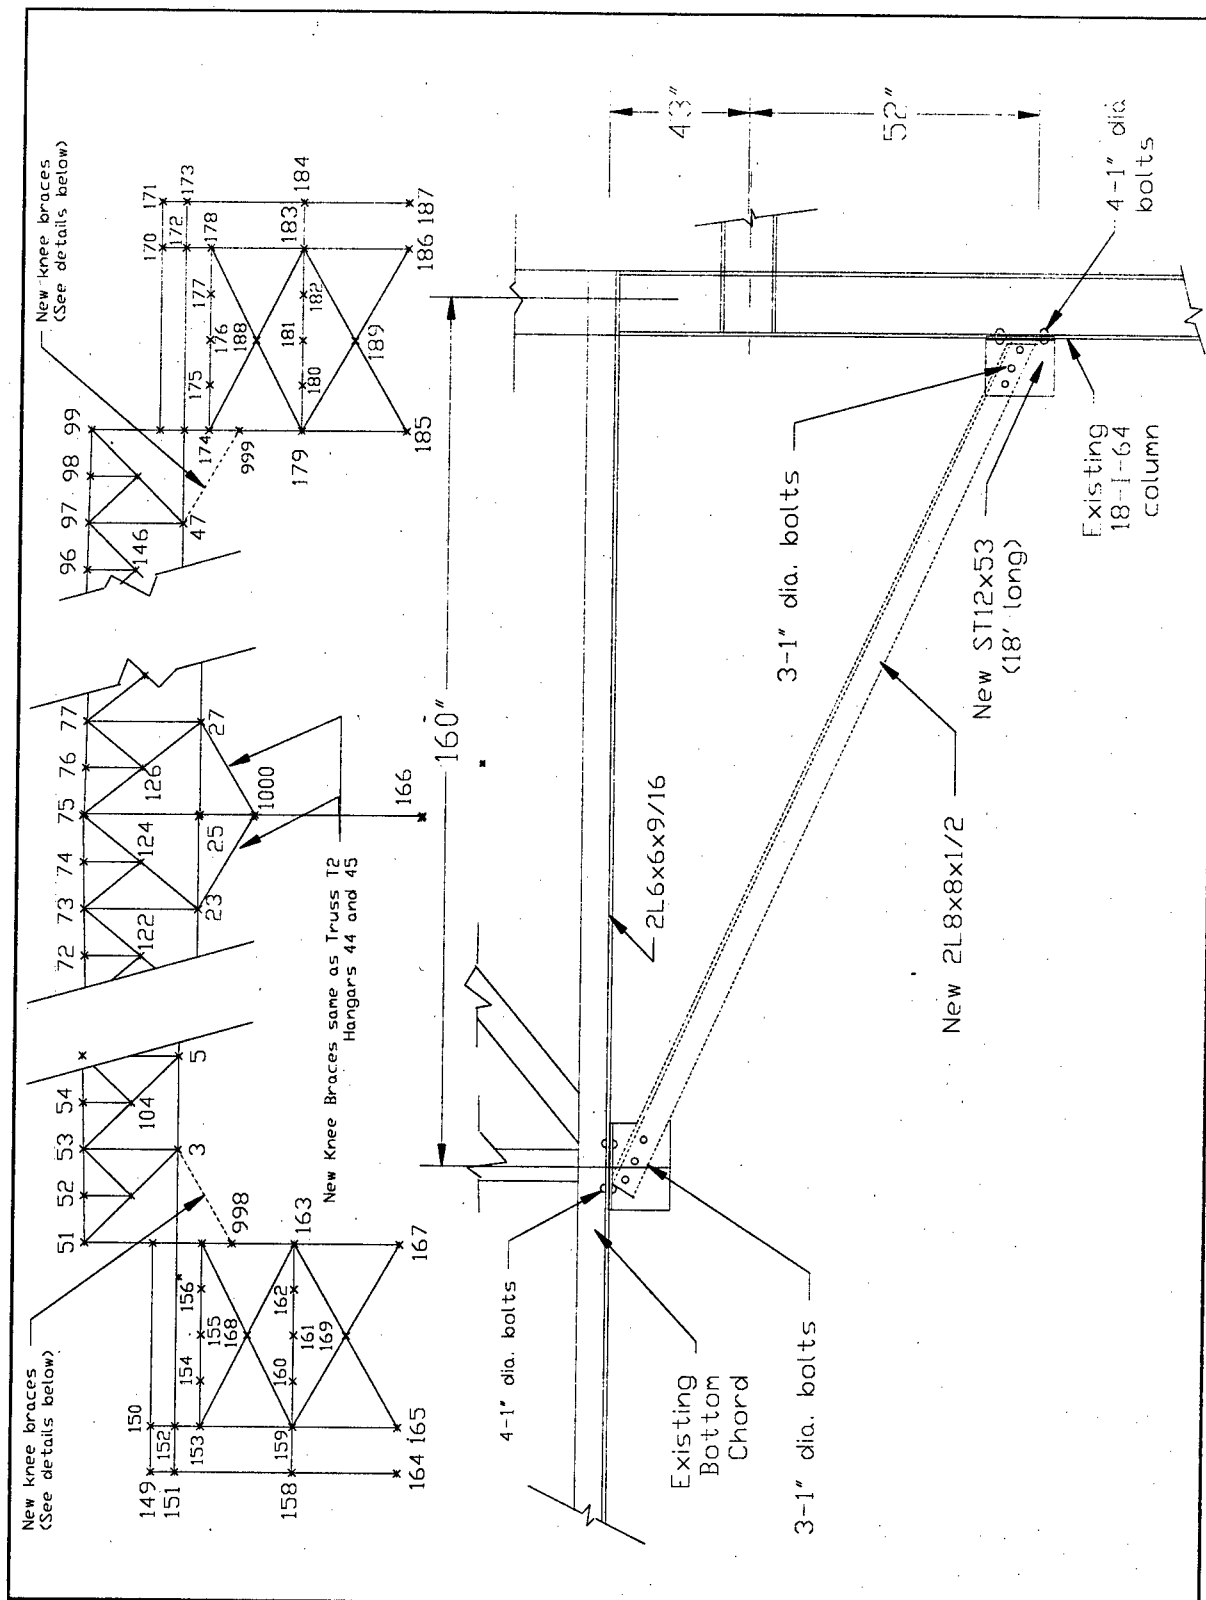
CCAD, TX, new knee braces for Truss T2, Hangars 43 and 47.
